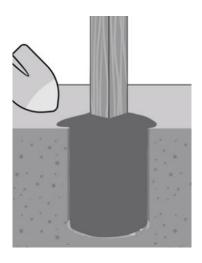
Sketch showing concrete filling of the whole²⁹⁵
